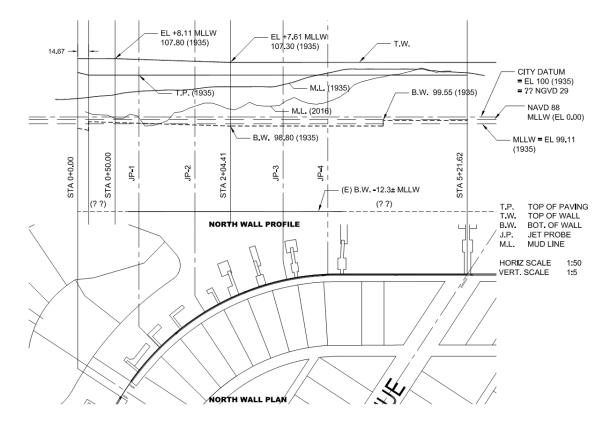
Plan and Profile of Existing Wall North of Collins Island
